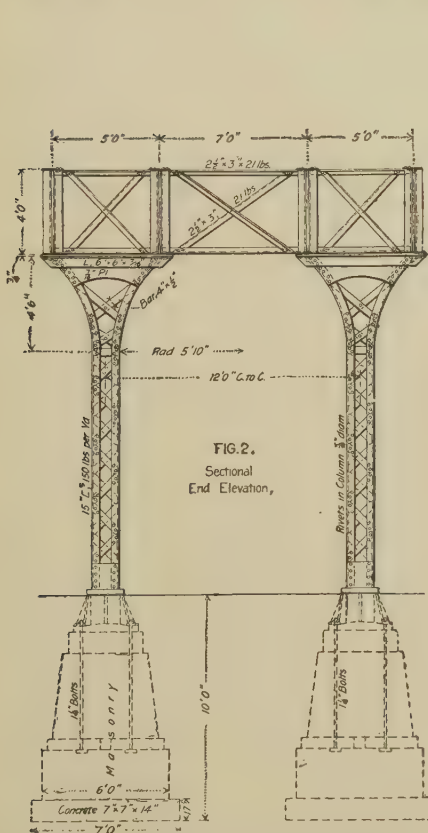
CROSS-SECTION OF THE CHICAGO AND SOUTH SIDE ELEVATED RAILWAY.
